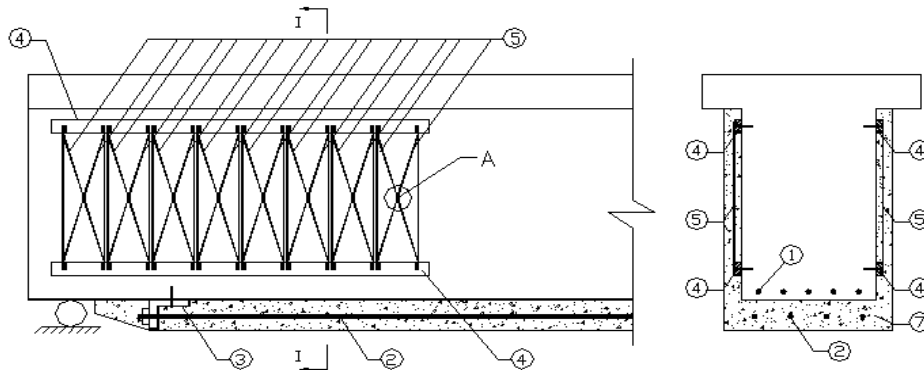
The schematic drawing of the reinforced concrete beams reinforced bonded prestress structure
